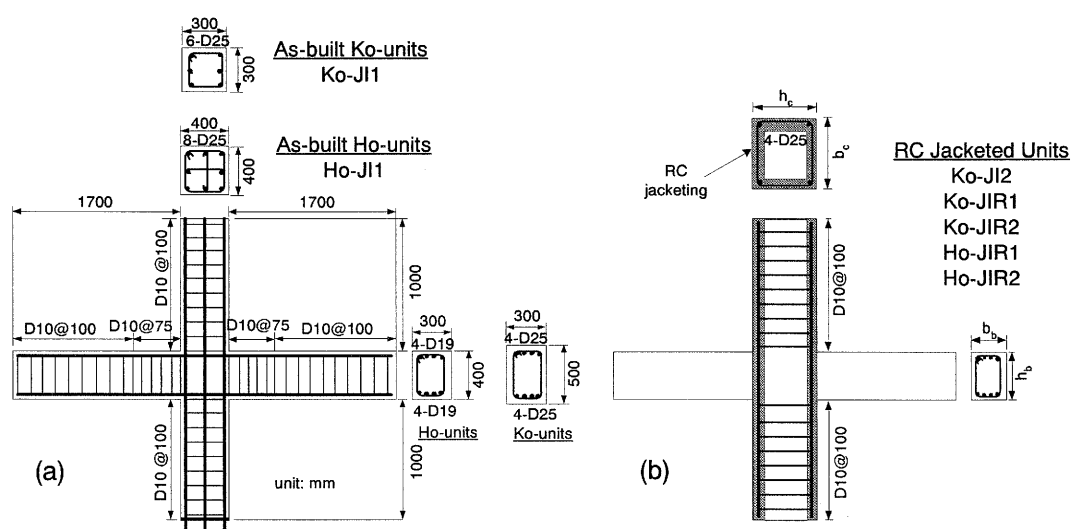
Details of Tested Beam-Column Joints: (a) As-built Units, and (b) RC Jacketed Units.
